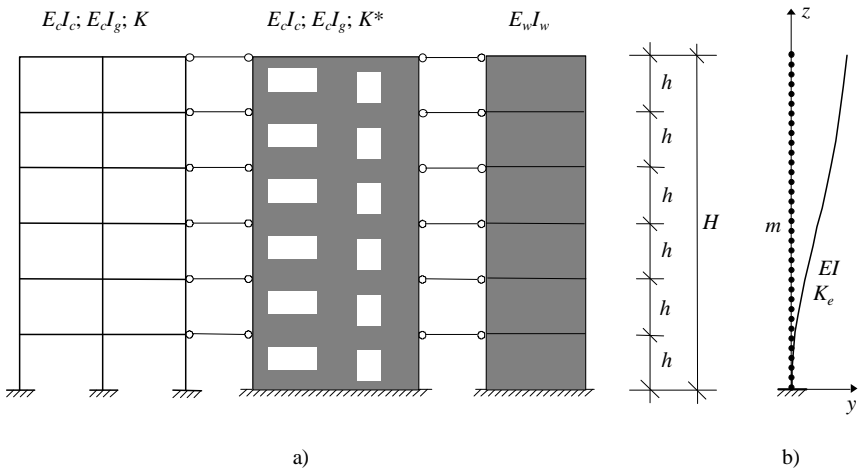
Model for the lateral vibration analysis. a) bracing system consisting of frames, coupled shear walls, shear walls and cores, b) equivalent column.
